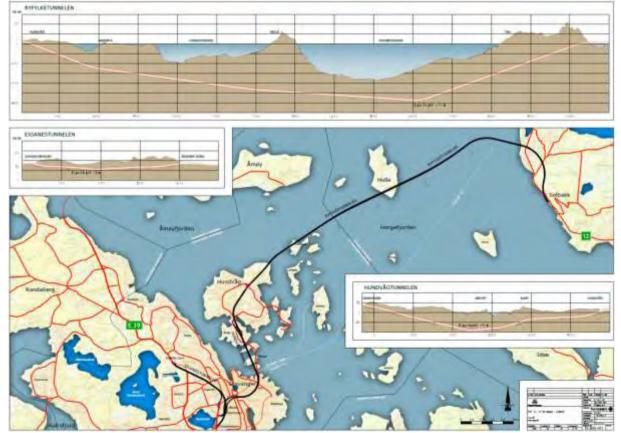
Plan view and longitudinal profiles of the Ryfast and Eiganes tunnels
